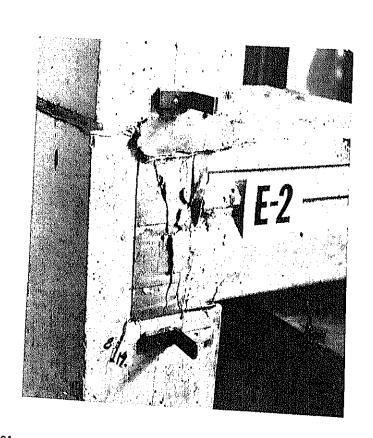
Damage Pattern at Ultimate Load - Exterior Joints
